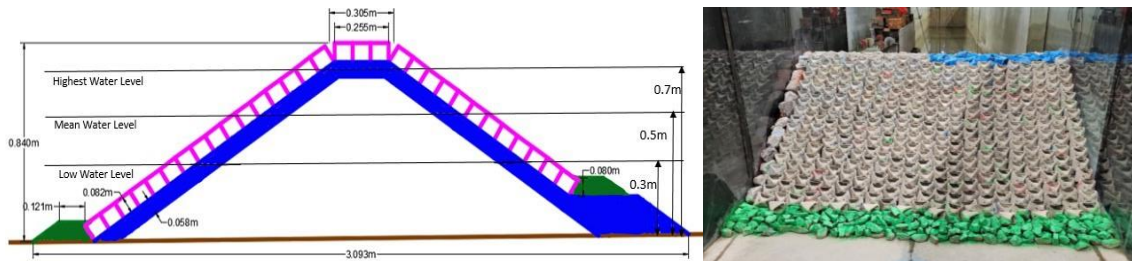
Emergent Rubble Mound Breakwater Cross-Section and Model Construction
